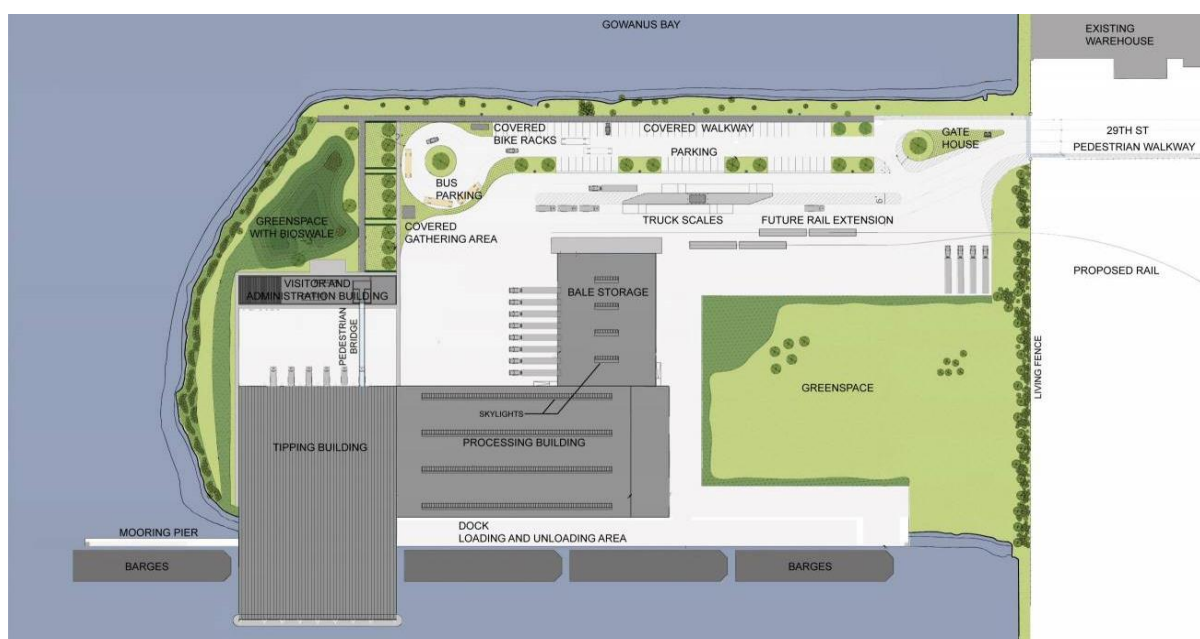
showing master plan arrangement of Sunset Park Material Recovery Facility. Source: Selldorf Architects (n.d.)
